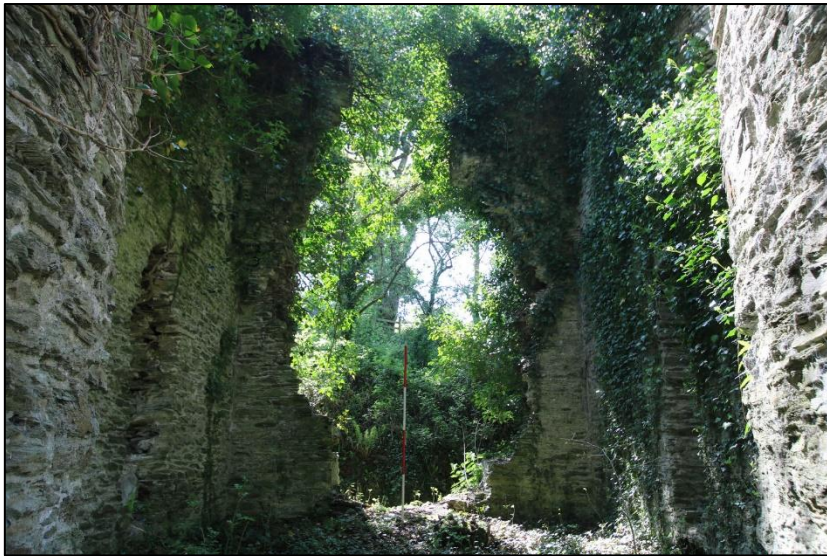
THE INTERNAL ELEVATION OF THE SOUTH-WEST WALL; FROM THE NORTH-EAST (SCALE 2M).
